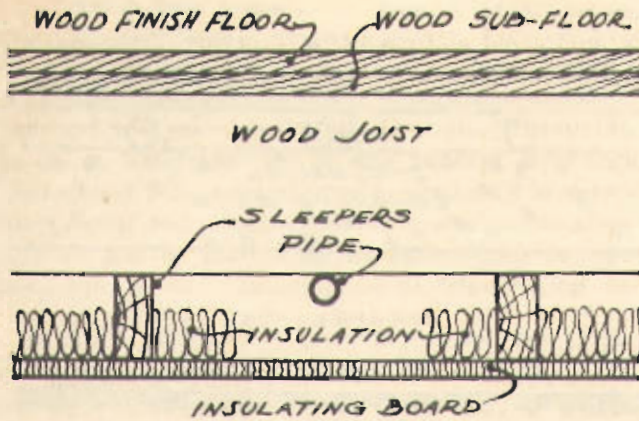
Conventional Wood Floor—Pipes Fastened to Bottom of Joists.
